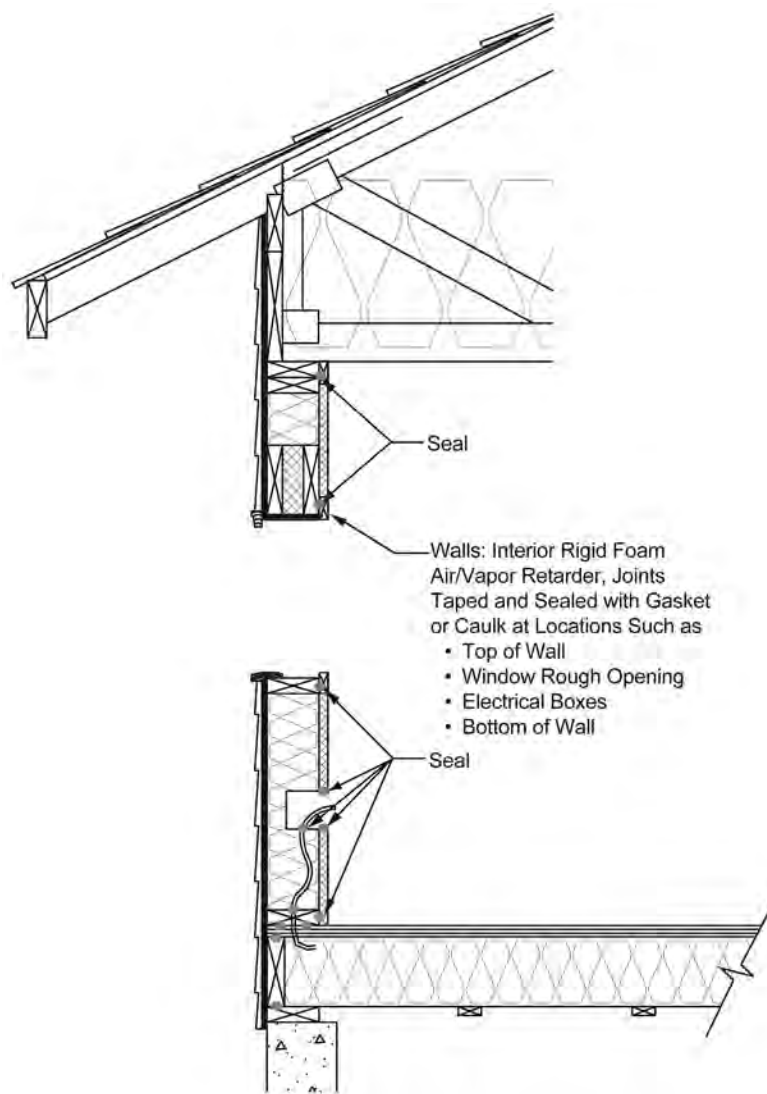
Single Wall With Interior Foam Insulation Used as a Vapor Retarder.
